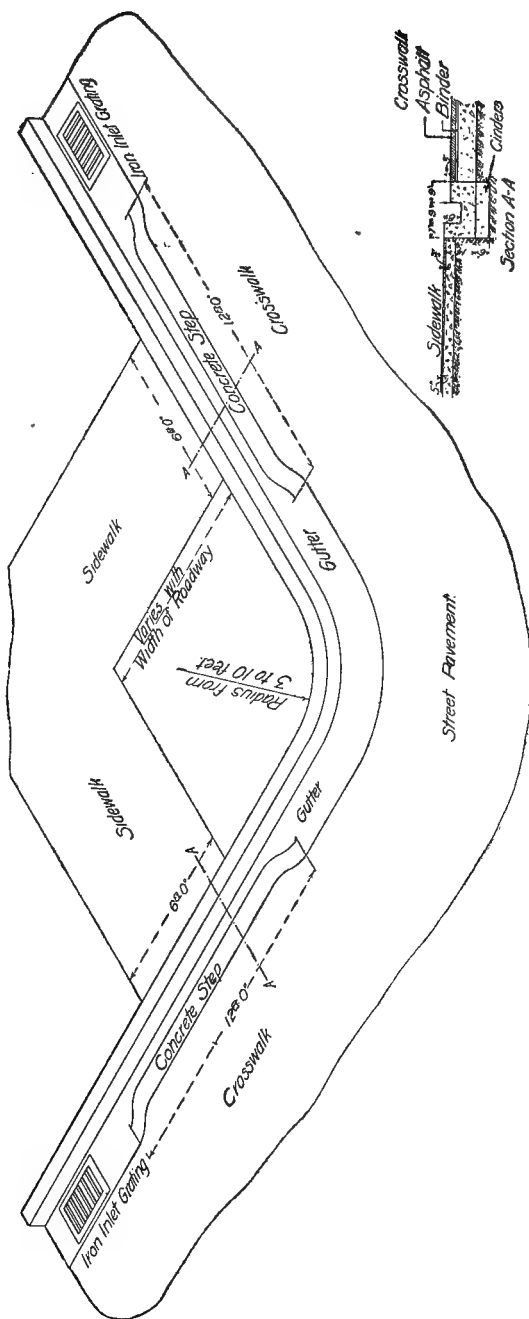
CONCRETE CURB AND GUTTER, AND CROSS-WALK CONSTRUCTION.
